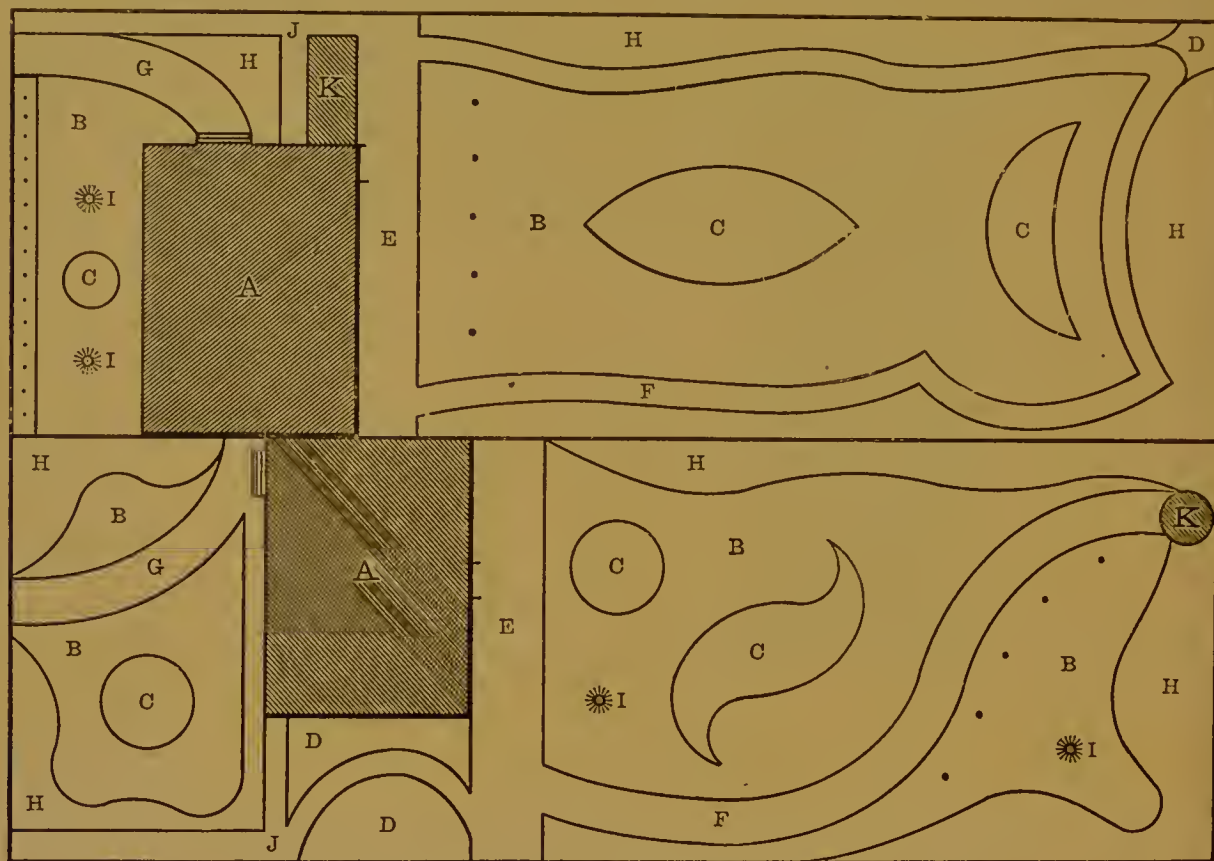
PLANS FOR SEMI-DETACHED HOUSES. (Scale 20 feet = 1 inch.)
